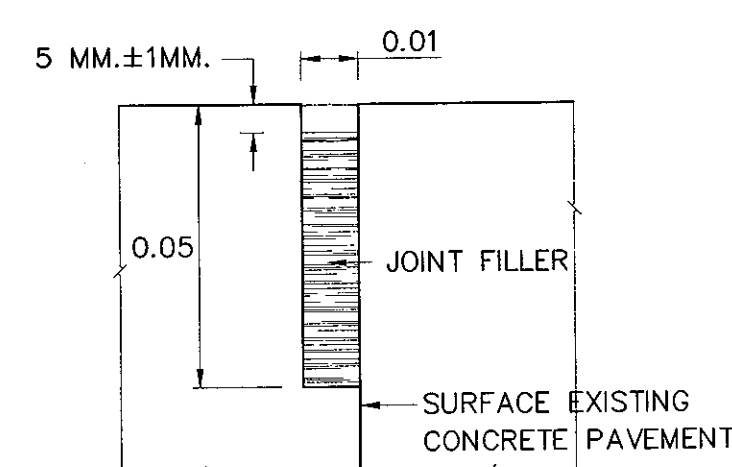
DETAIL OF SAWED JOINT FOR TRANSVERSE JOINT
